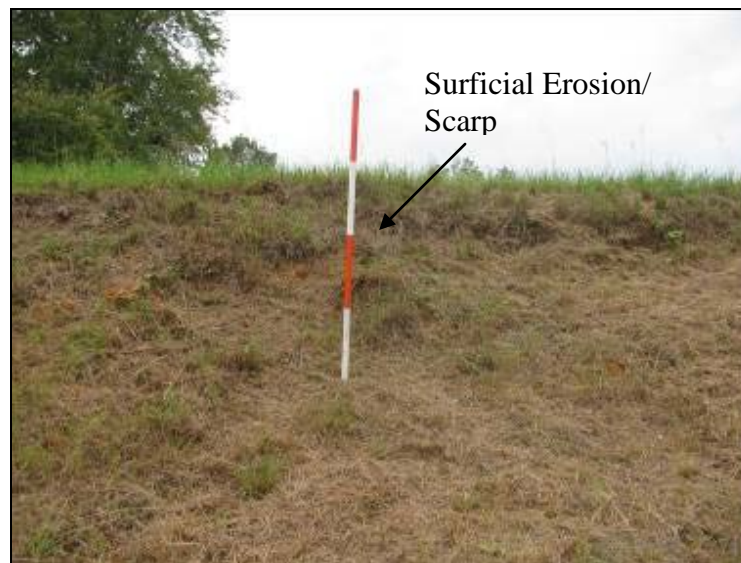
Ash Pond – West embankment interior slope surficial erosion/scarp, looking west.
